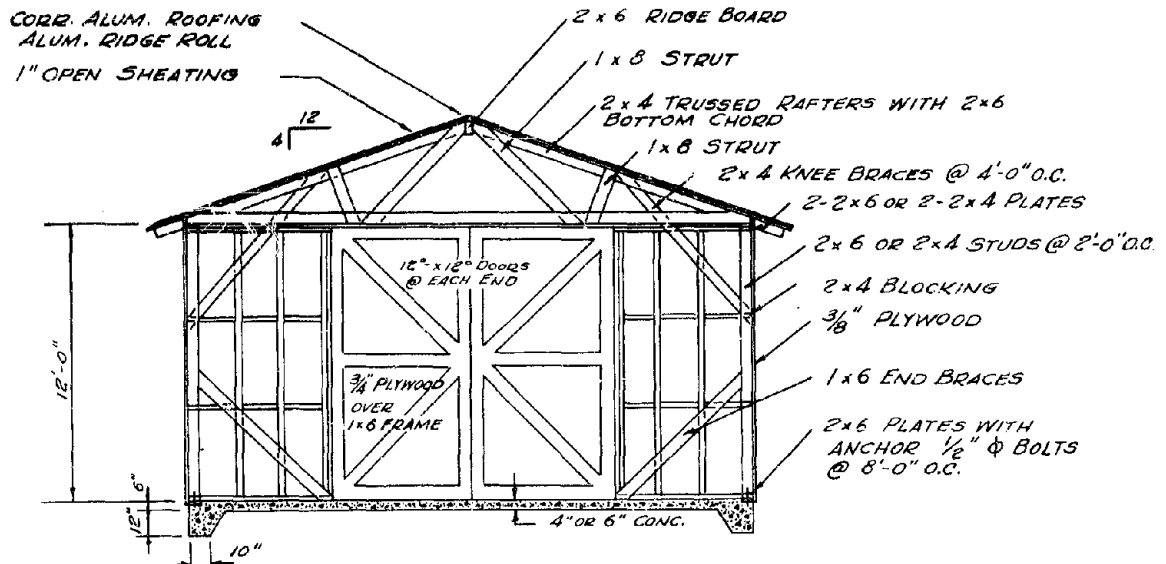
Typical Warehouse Section, Tare Island, 14-3/4 Miles from GZ
